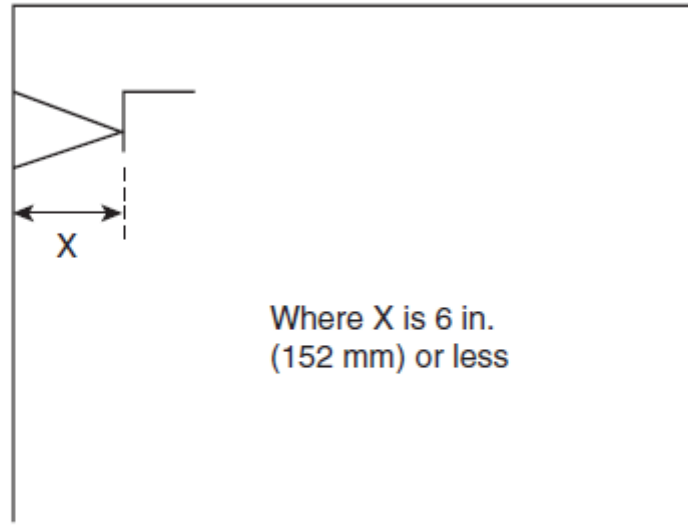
Sidewall Sprinkler Deflector Measurement From Walls.
